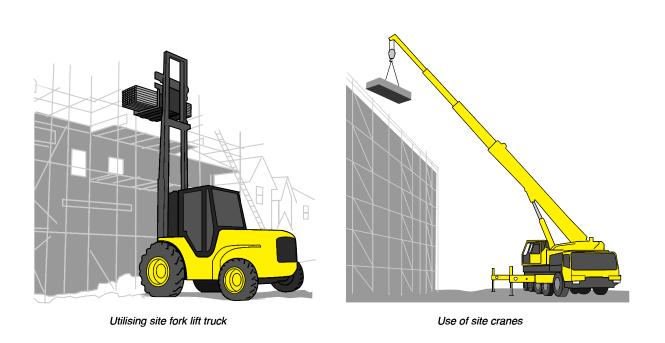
Examples of site mechanical handling equipment utilised for scaffolding.
